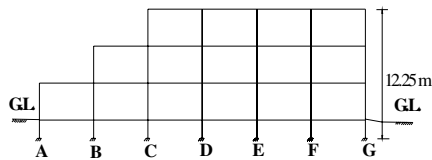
STEP BACK SET BACK BUILDINGS ON SLOPING GROUND (4 to 11 storey)
